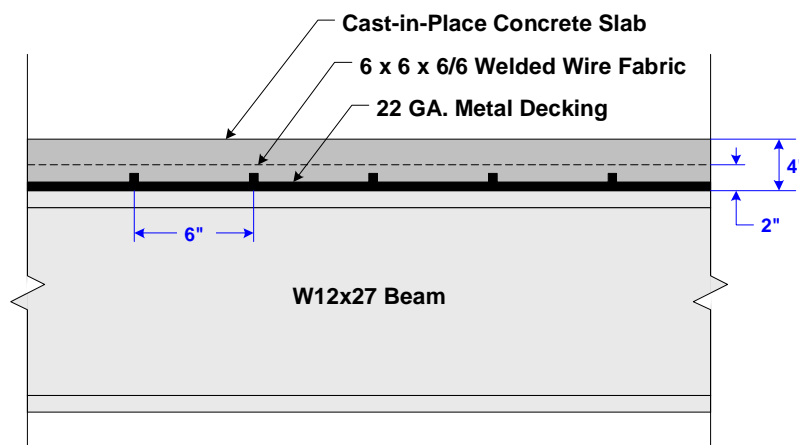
Test Assembly (Elevation View – Not to Scale)
